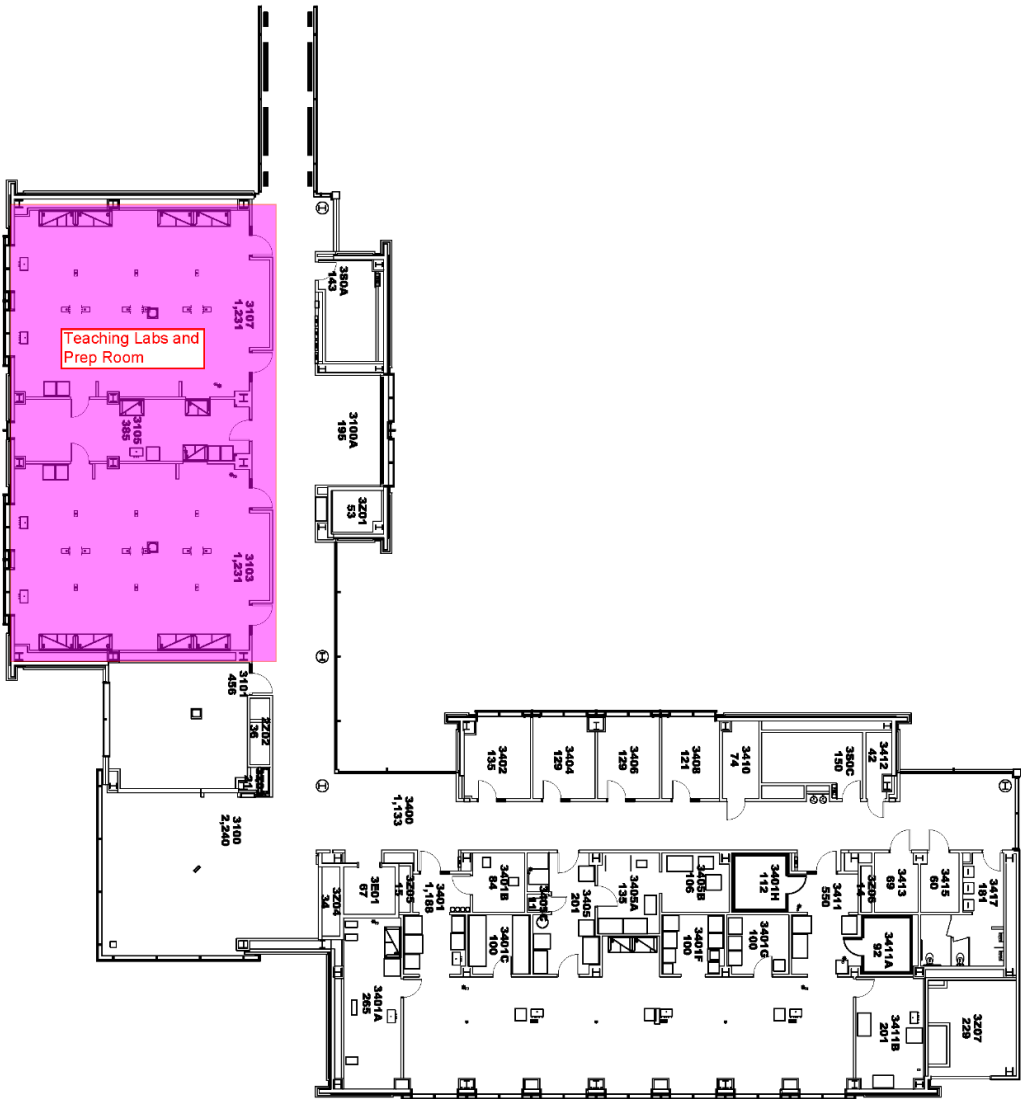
Floor plan for Davis Hall, 4th floor.
